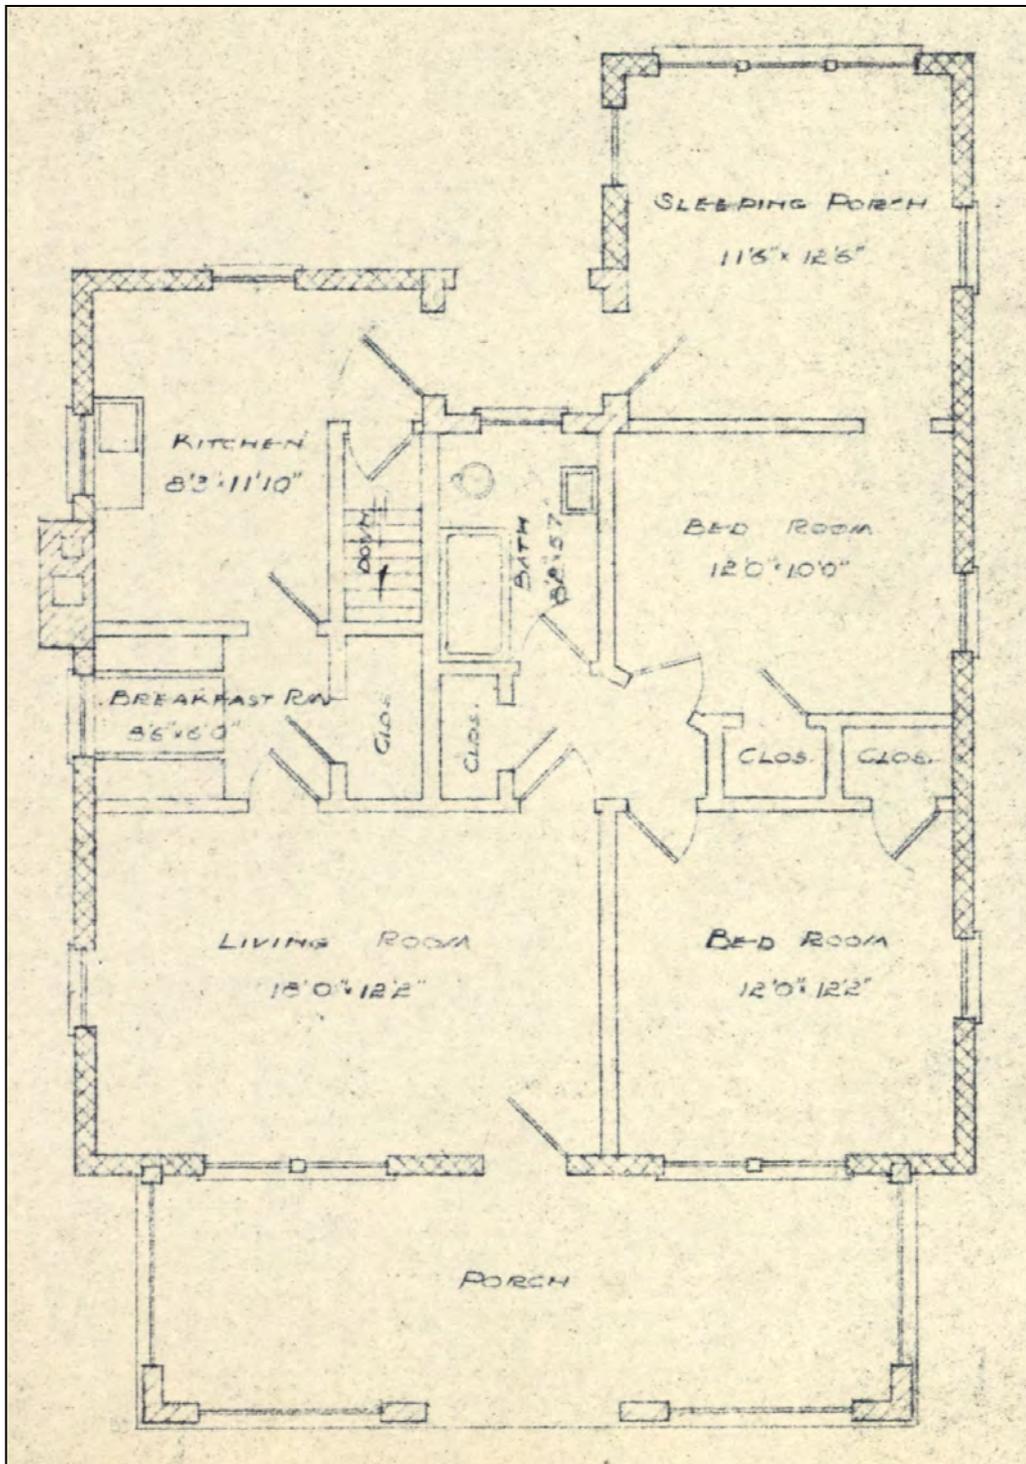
Typical floor plan for the one-story NCO quarters with breakfast nook (Source: Fort Sill Digital Archive 1800A_B1822_BB07_B543).
